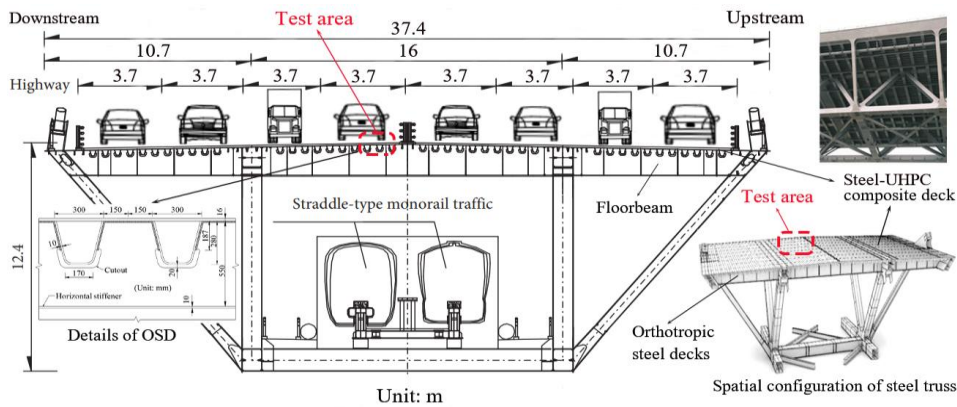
Standard cross-section configuration of the steel truss girder.
